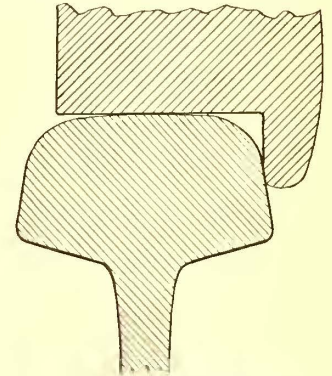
SHARP FLANGE ON IMPROVED RAIL SECTION.
